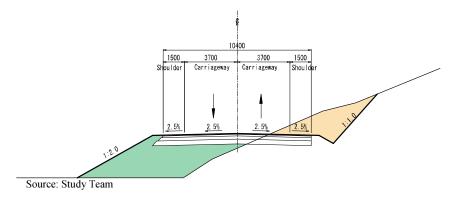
Typical Cross-Section of the Malfakassa Bypass
